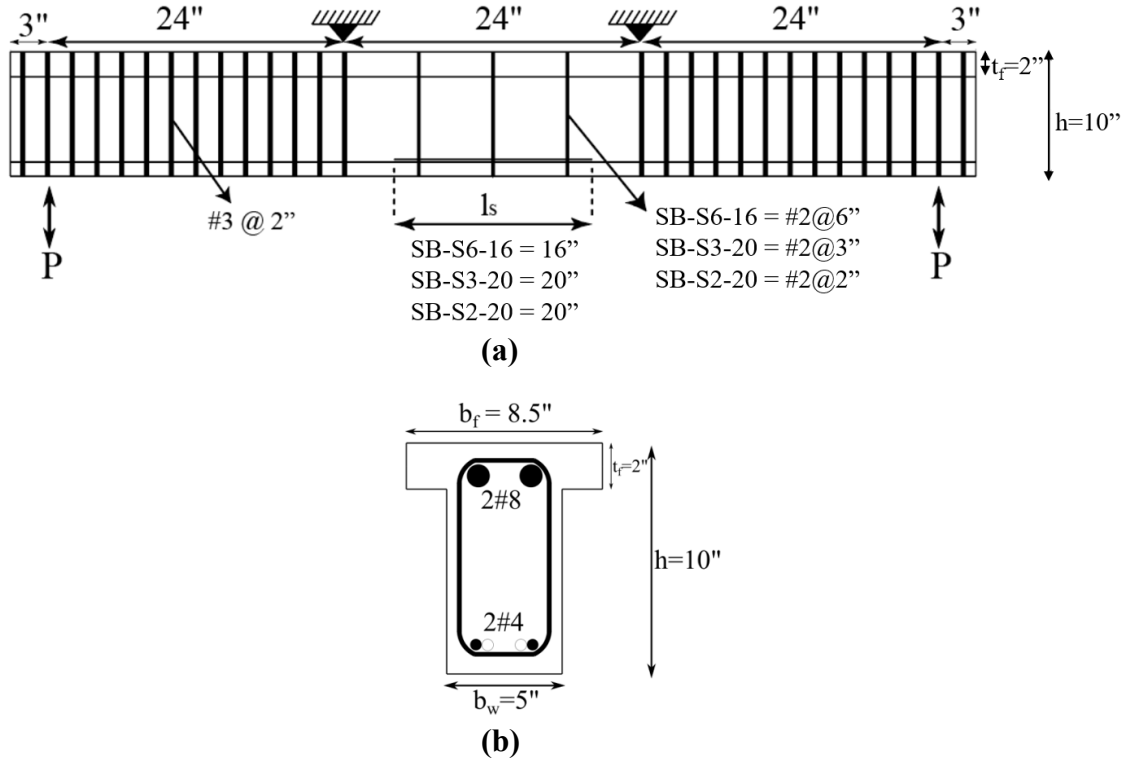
Small beam tests: (a) elevation view; (b) cross section (Unal et al., 2024)
